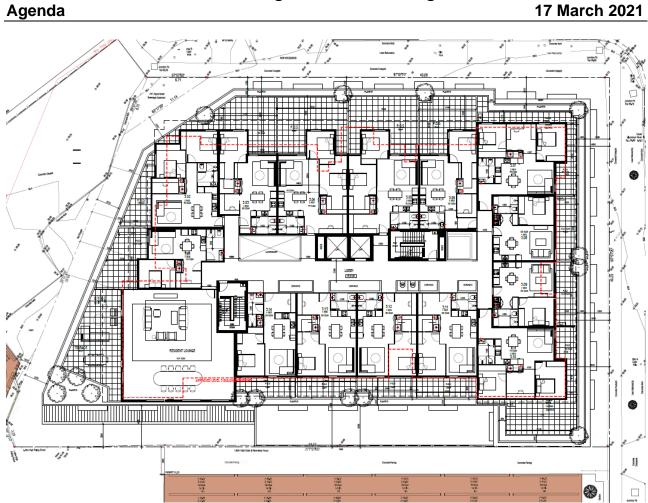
Proposed third floor layout with the red dashed line showing the approved envelope.
